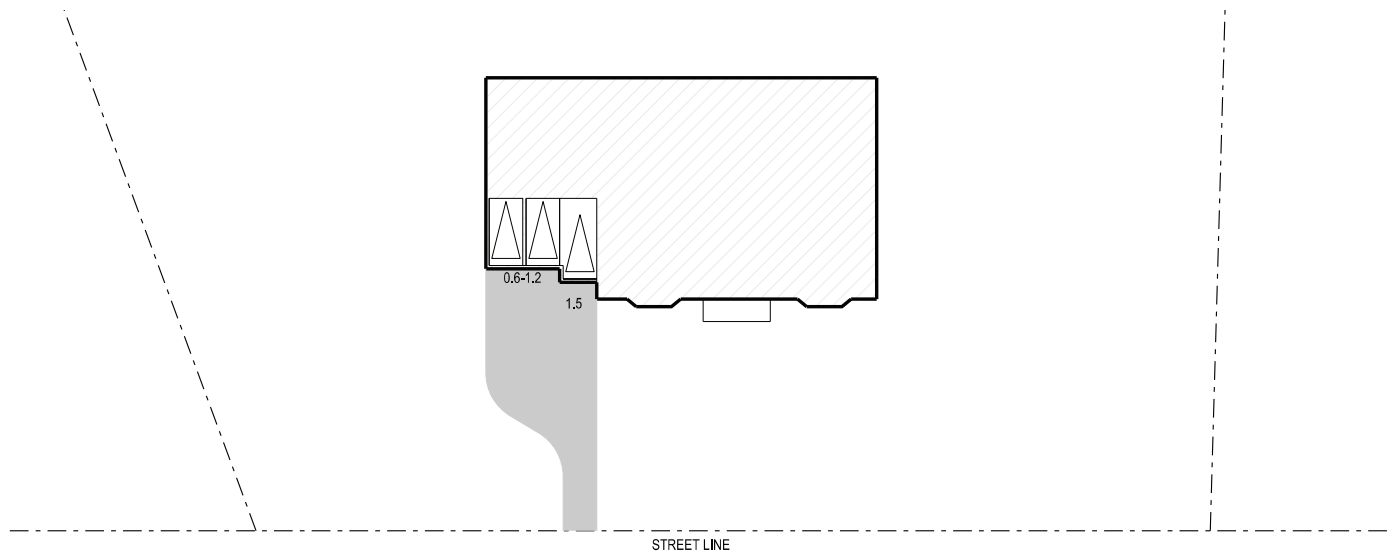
Sketch of street facing 3 car staggered garage arrangement
